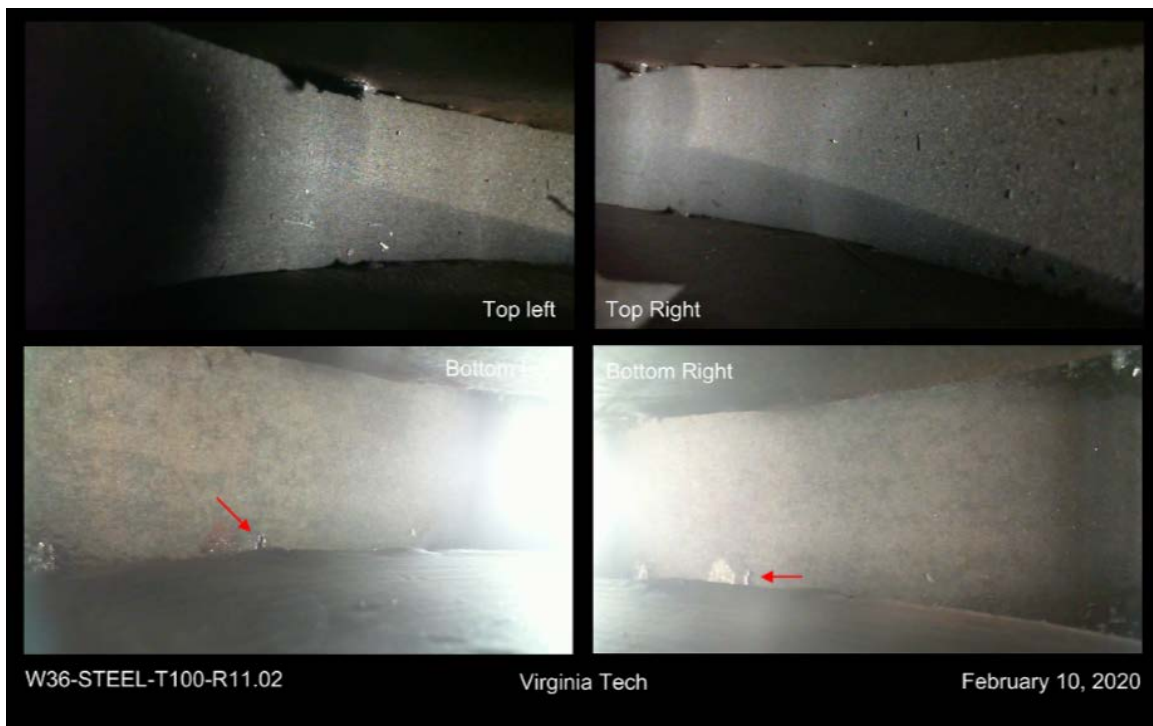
Fracture initiation of W36-STEEL-T100-R11.01.
